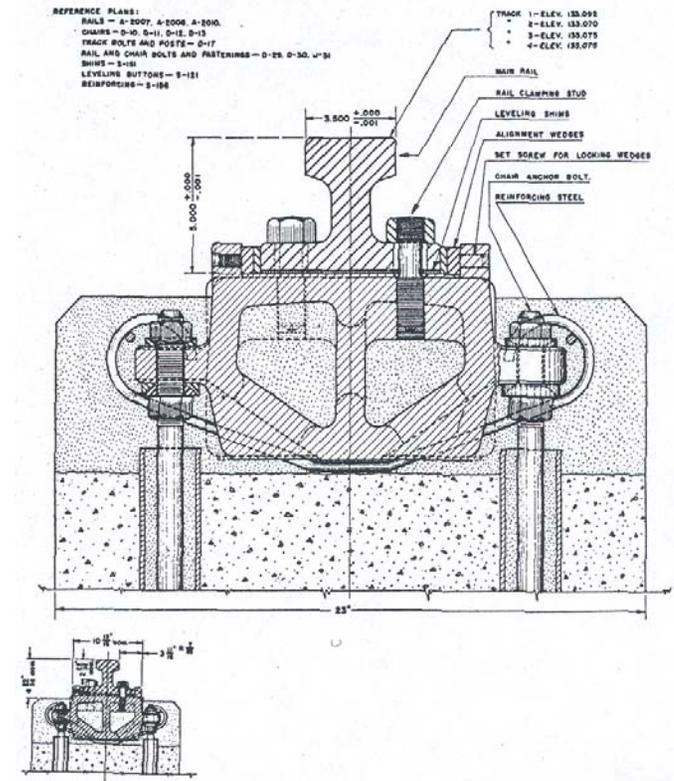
TYPICAL TRACK SECTION THROUGH MAIN RAILS, CHAIN AND FOUNDATION FOR TOWING CARRIAGE TRACKS.
